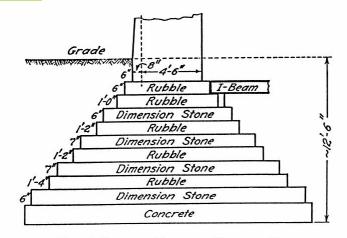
SECTION THROUGH EXTERIOR PIER OF HOME INSURANCE BUILDING
